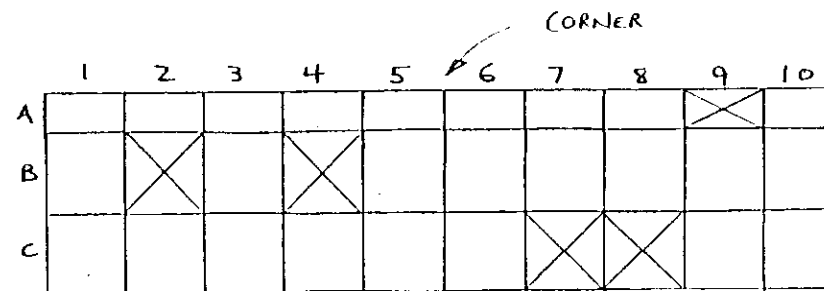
Survey Grid Locations, Building 8 Office Area -- Floor
